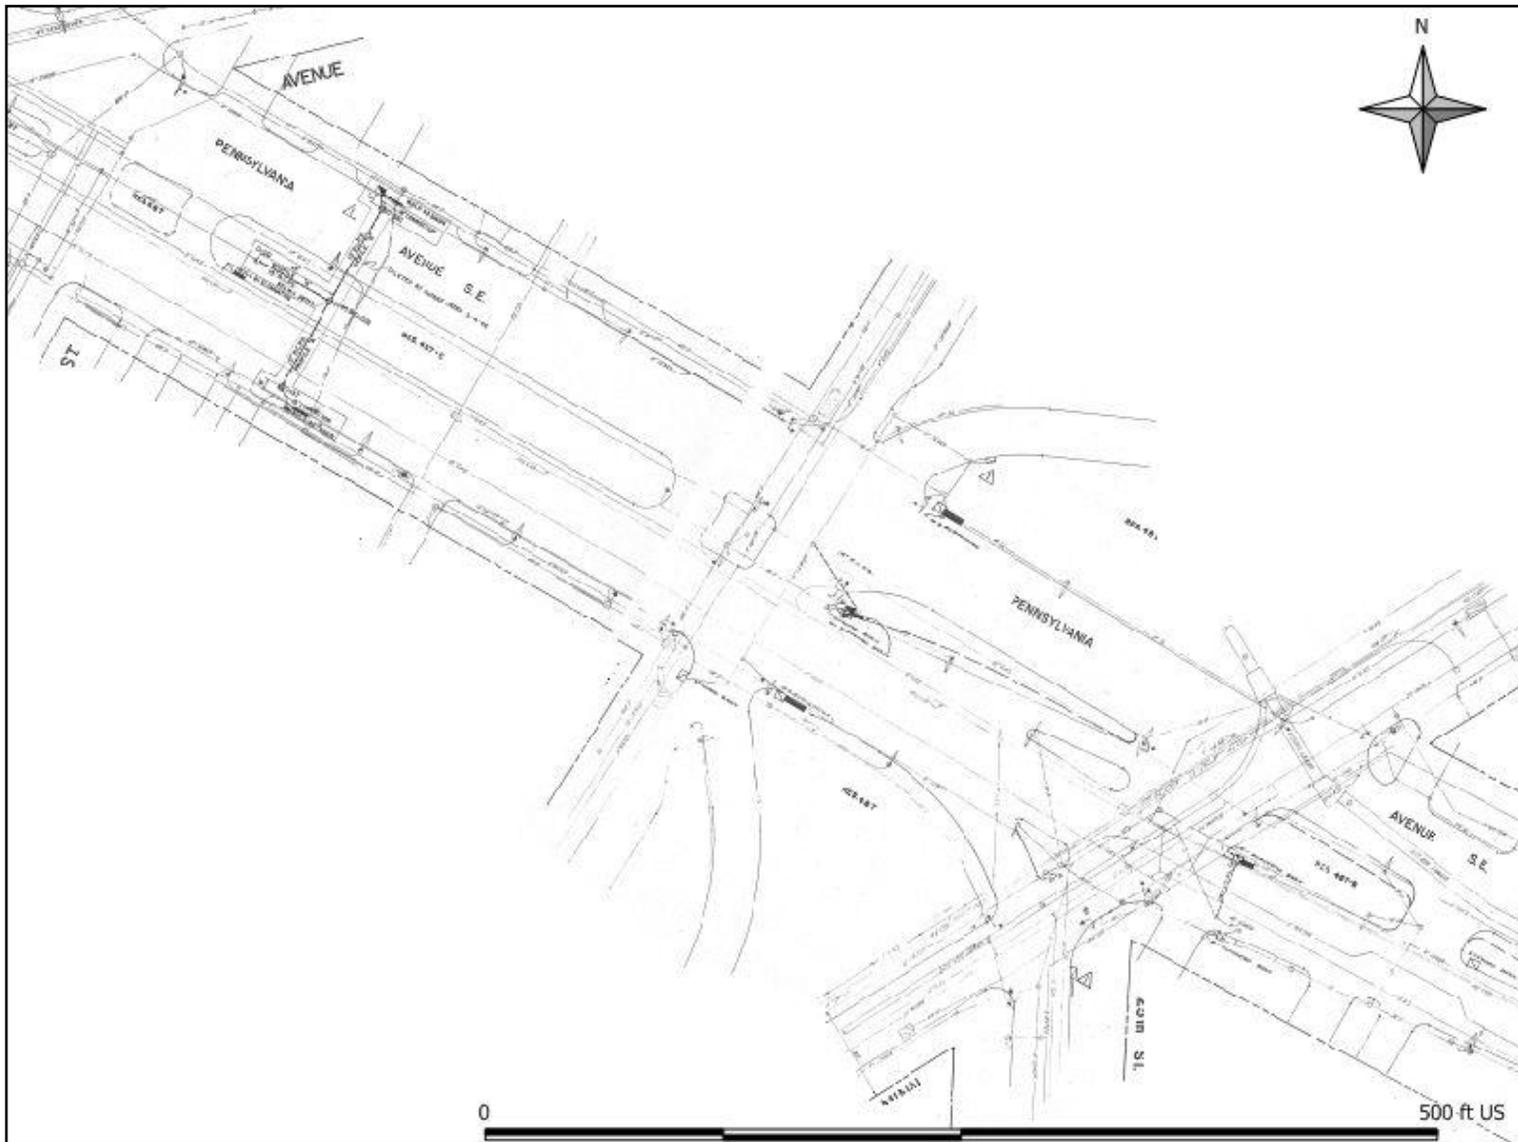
1969 As-Built and Planned Improvements, Pennsylvania Avenue.
